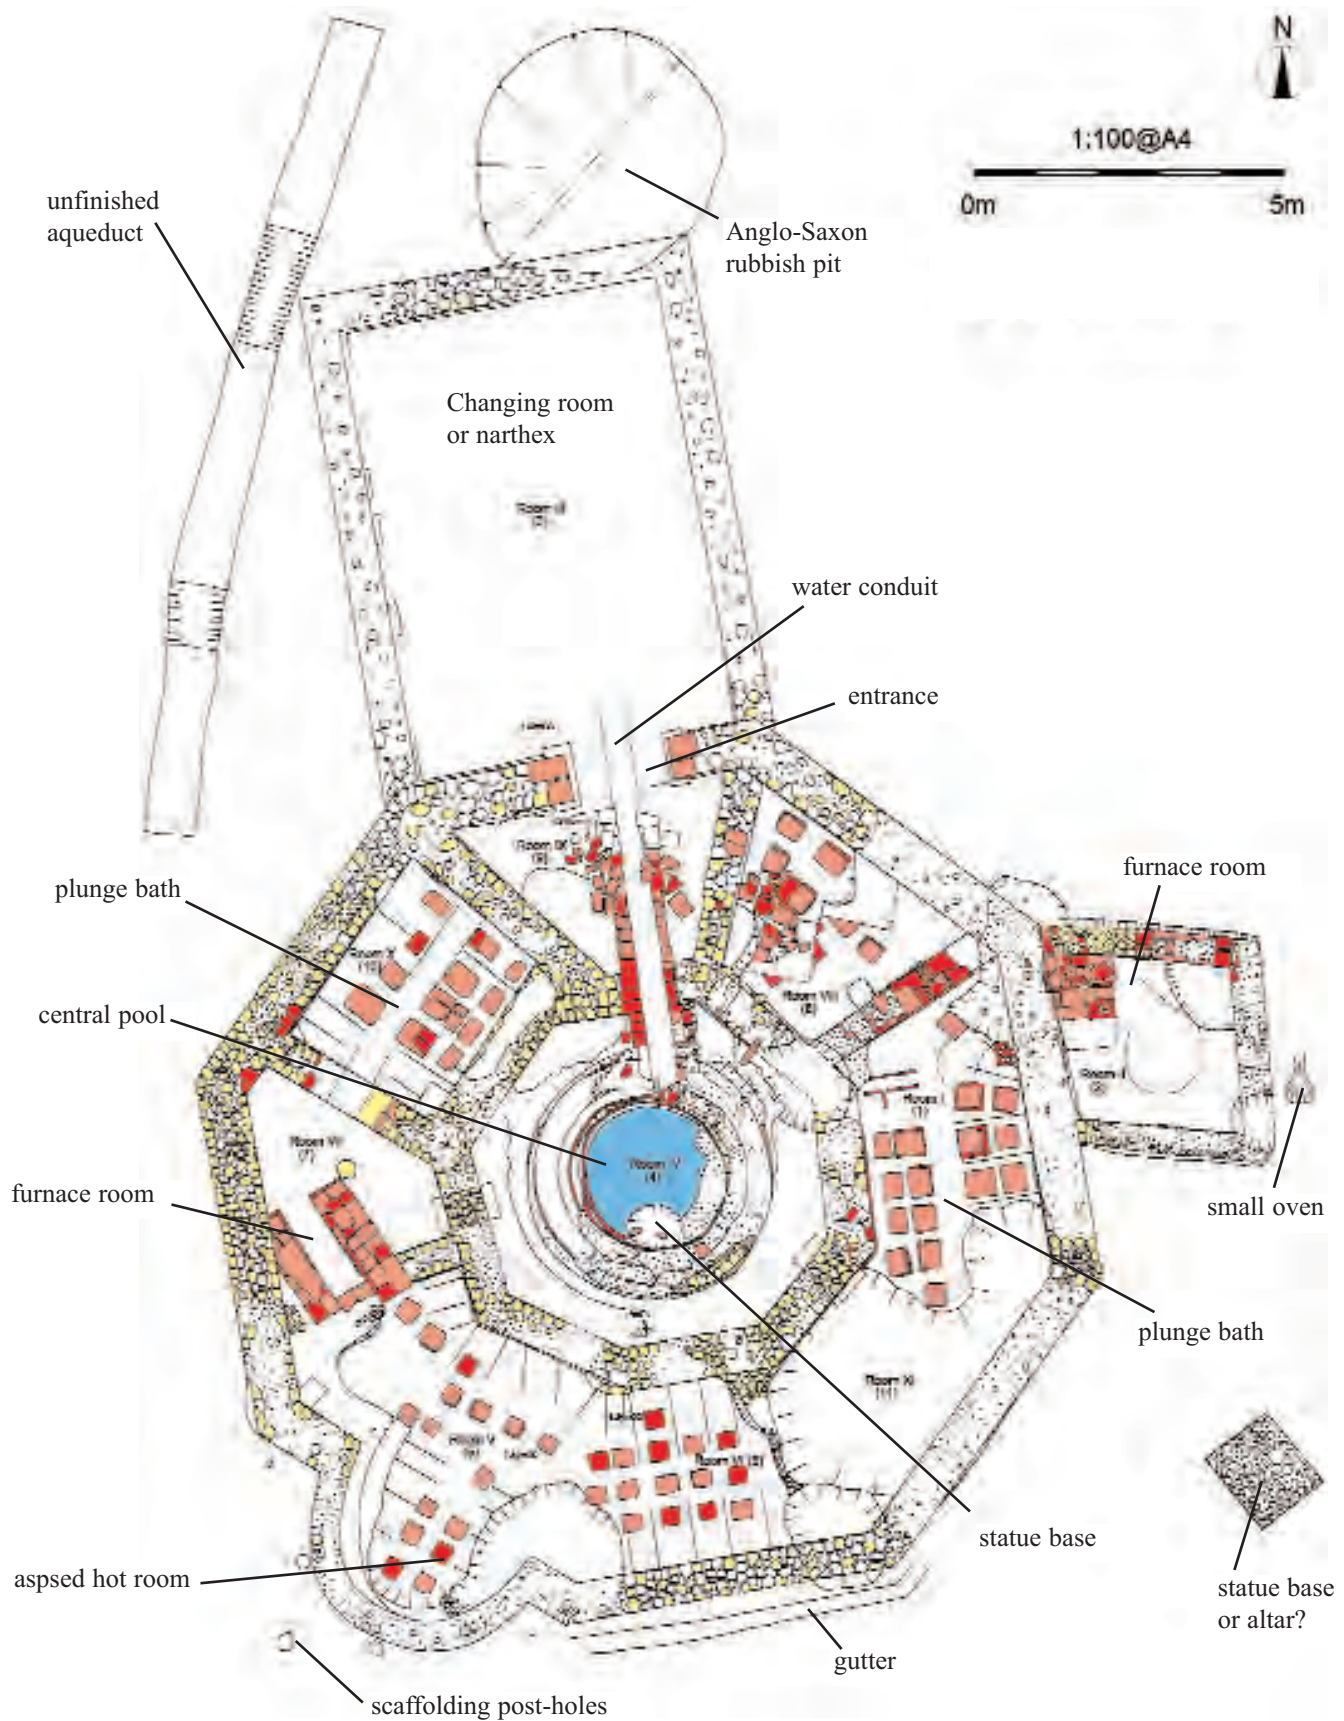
Ground floor plan of the building showing the various rooms arranged around the central pool. The two furnace rooms are labelled, one (Room 7) is internal and heated Rooms 5 and 10, whilst the external furnace room (Room 2) heated Room 1. Inside Room 2 you can see the location of the furnace walls (the one to the south robbed out) and
